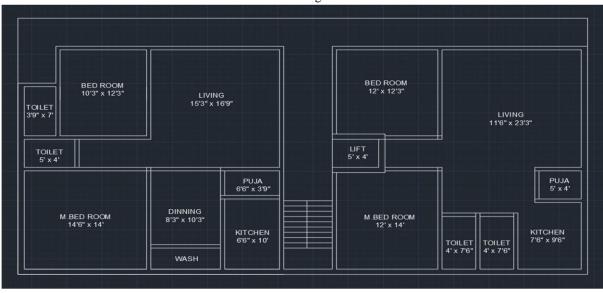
Plan of G+4 Reinforced Concrete building (all dimensions are in meter)
